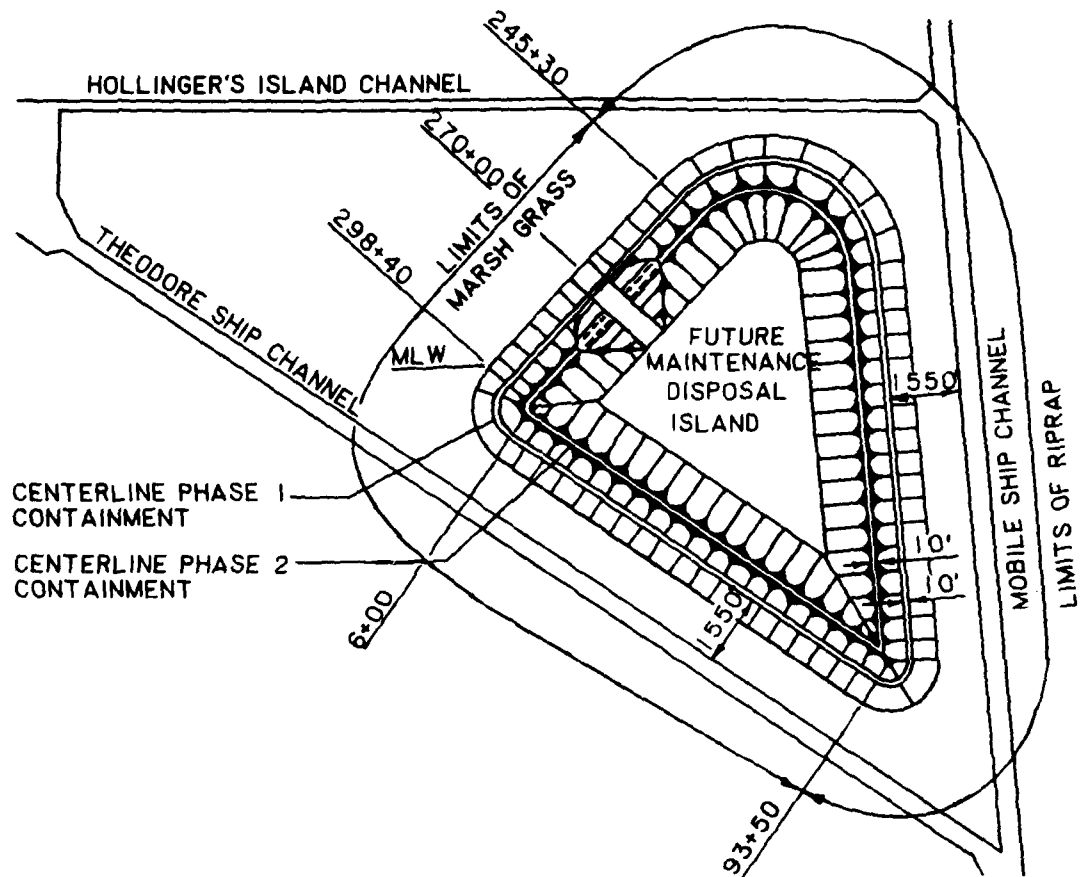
Plan view of proposed design and shoreline protection for Theodore Ship Channel Disposal Island
